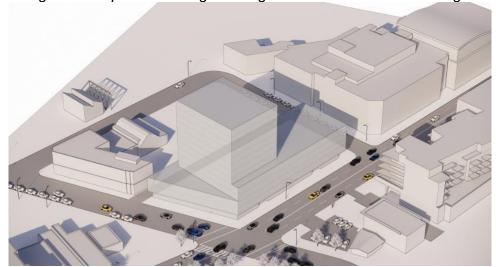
Proposed Building Massing – 6.5 FAR and 45 Metre Height
